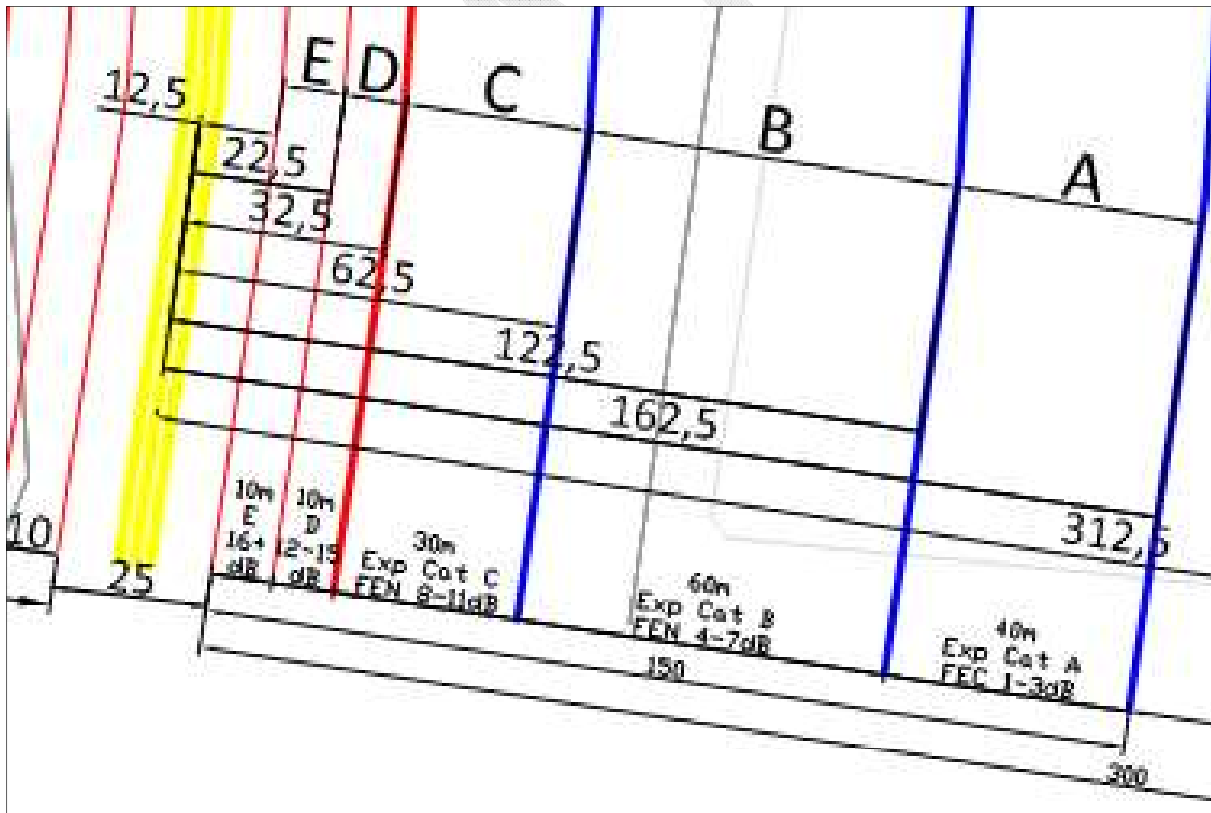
QUIET HOUSE PACKAGES LOCATIONS IN DETAIL
